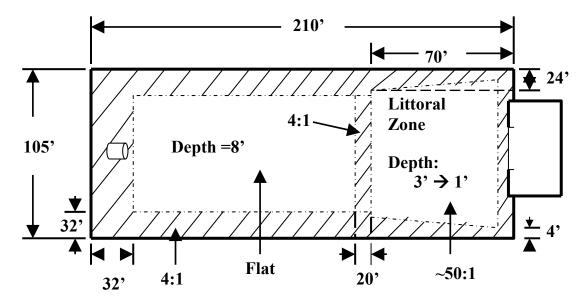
G.1-2 Plan View of SWFWMD Pond at the Top of the Permanent Pool Volume.
